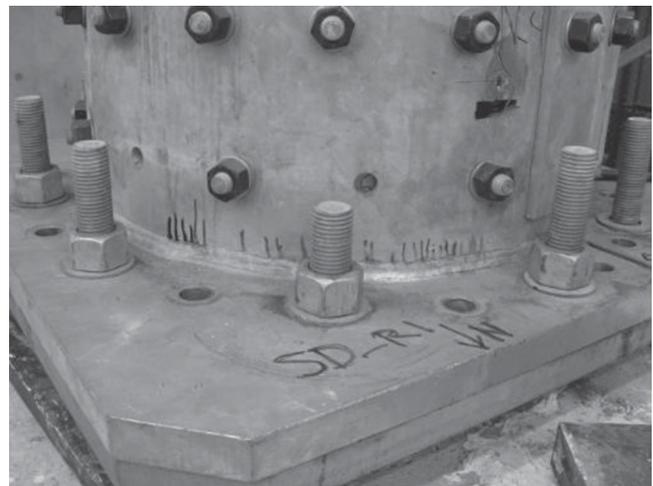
Specimen TR_1: north crack at upper weld toe after inspection with dye penetrant.
